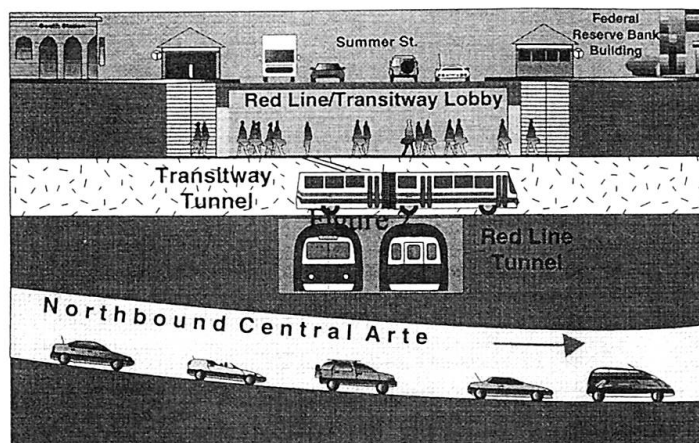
Artist rendition of CA/T Tunnel Crossing under MBTA Red Line Tunnel and Transitway Tunnel.
